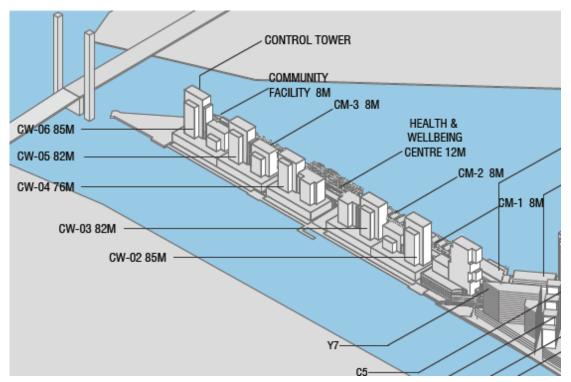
Dimensional Building Heights Diagram (source: Figure 6.4.2 2015 Development Plan)
